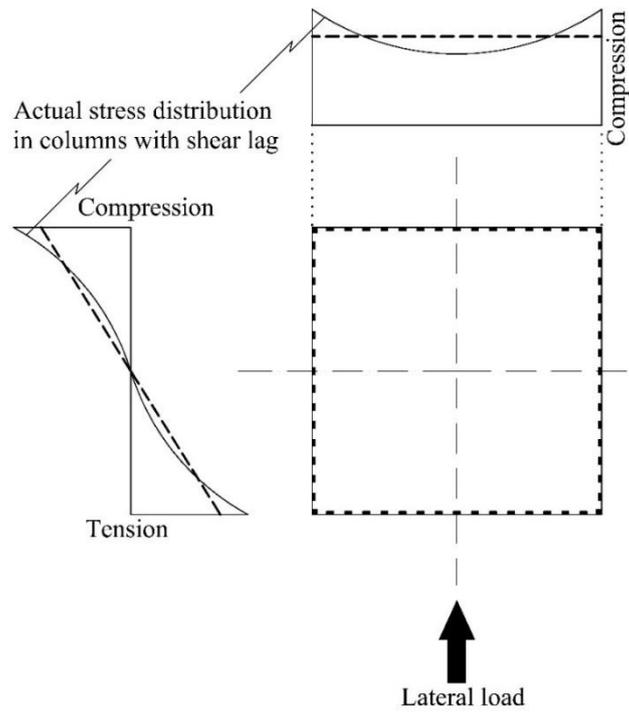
Tension and shear lag in perimeter columns in a framed-tube system
